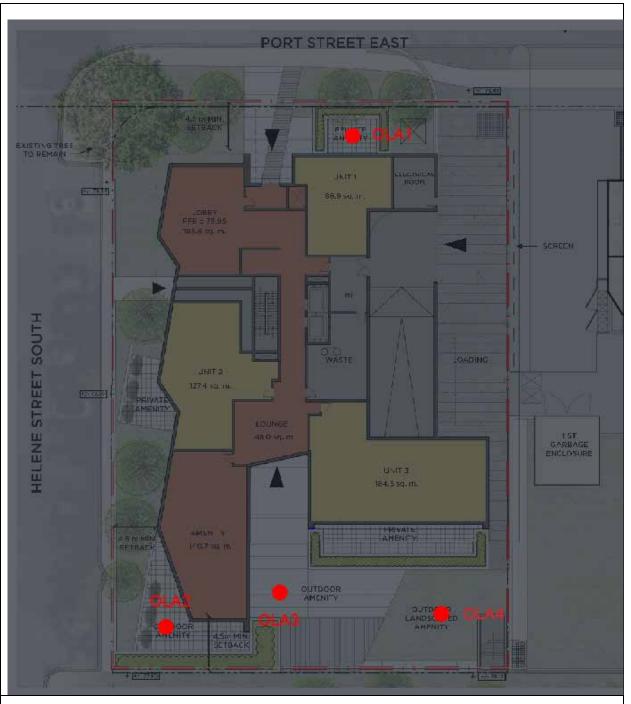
GROUND FLOOR PLAN AND SOUND LEVEL CALCULATION LOCATIONS
